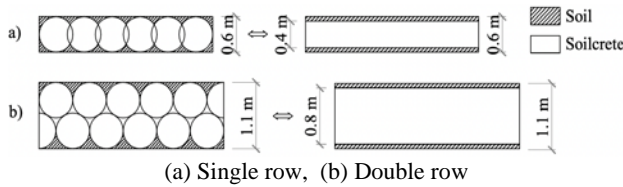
Soilcrete Walls to Reinforce Earth Levees
